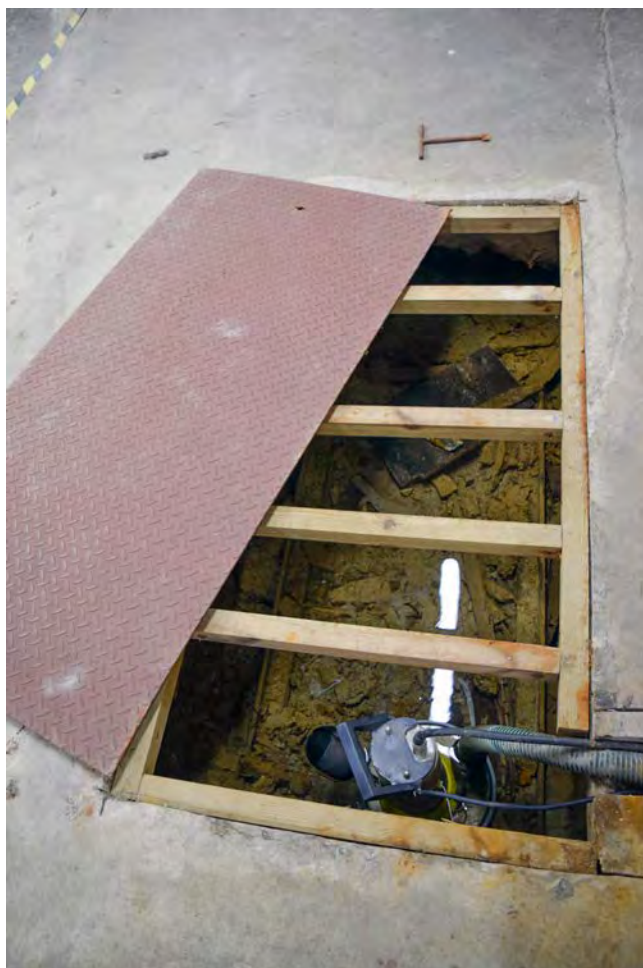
The sub basement of 31 Cornmarket Street, looking west
